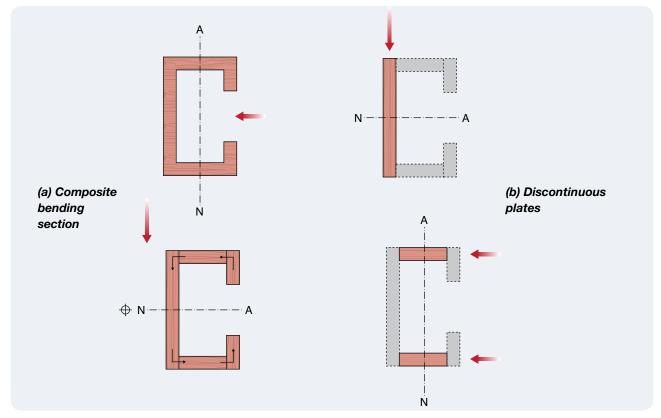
Plate connections in composite bending sections and discontinuous plate model of cores.
